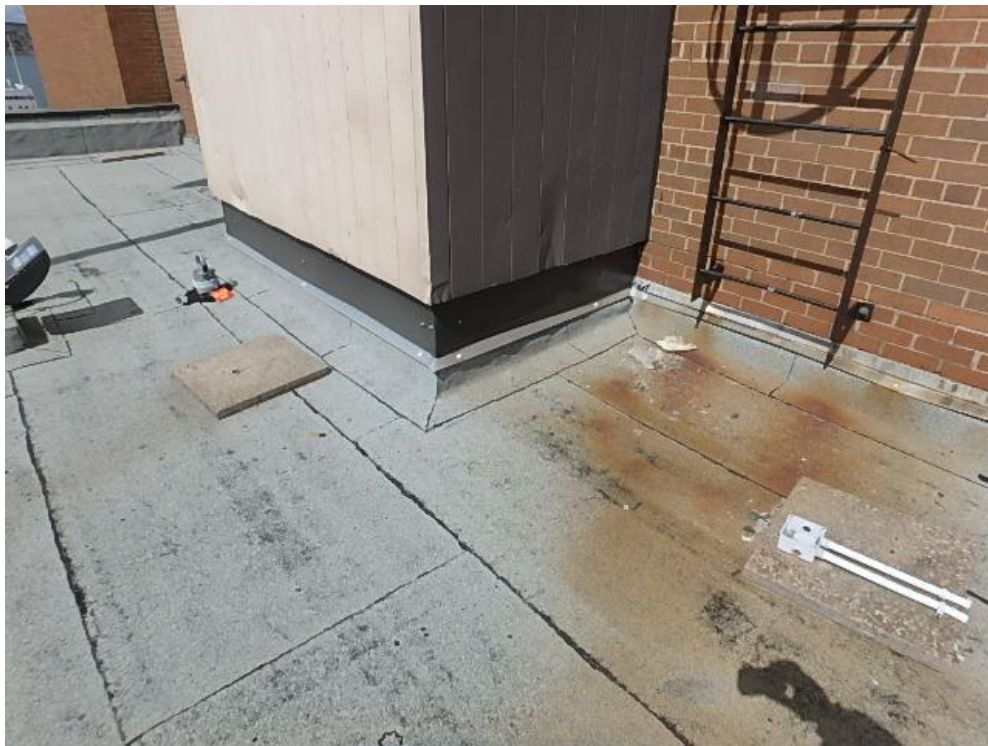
Roof Area 1.1. Corner of roof area at adjacent wall showing worn, and tented flashing, sealant between parapet and wall, and reglet detail at wall. Both wall transitions are poorly sealed.
